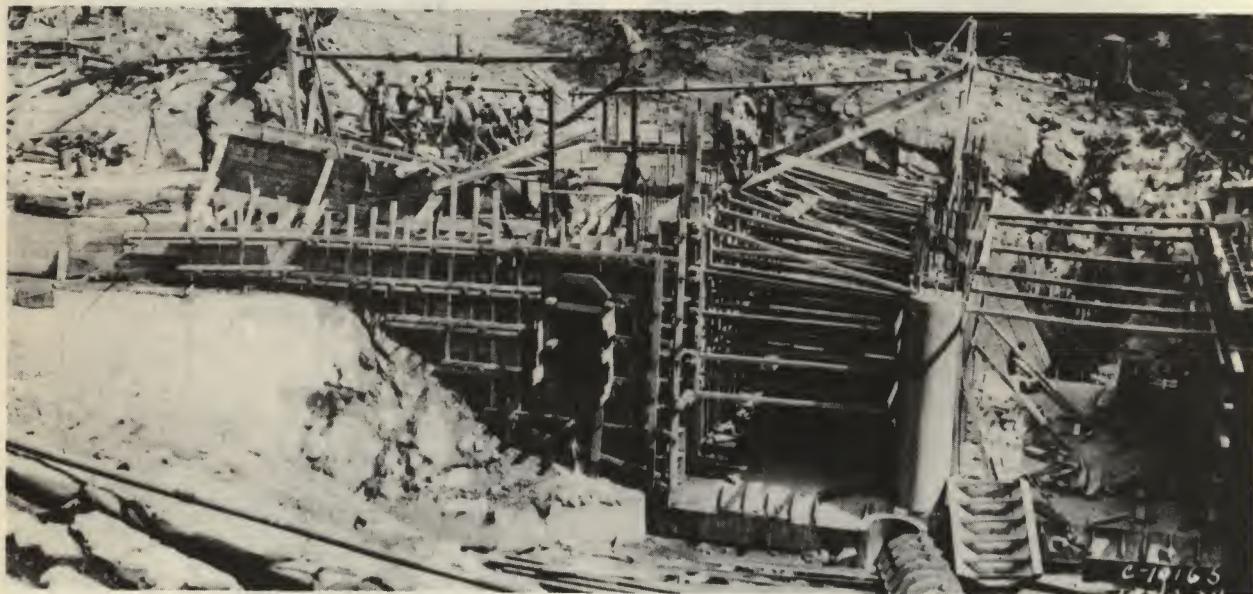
Cableway elevated by "A" frame. Cable over draught tube and power house comes straight off of Pumpcrete under building at extreme left side of picture.
